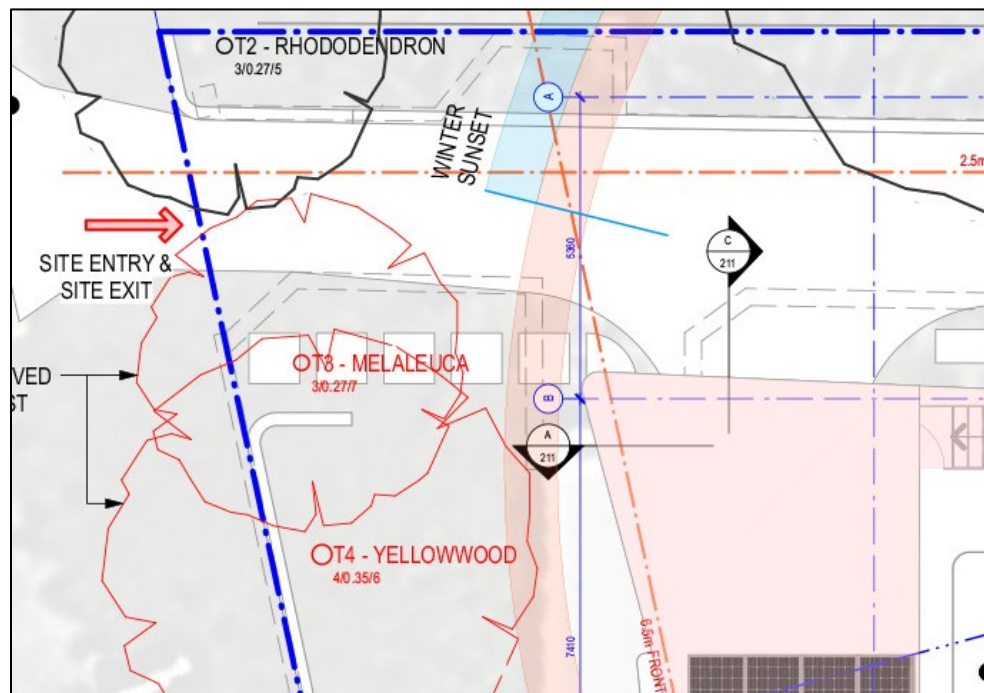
Figure C: Excerpt from the Site Plan showing proposed path and new wall near Trees 3 and 4.
